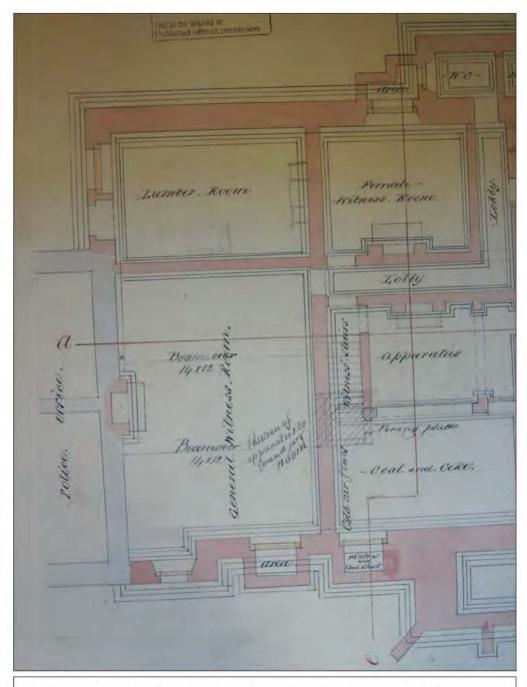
Plan if the County Hall Dated 1867 (Source: Gwynedd Archives XS/8)
